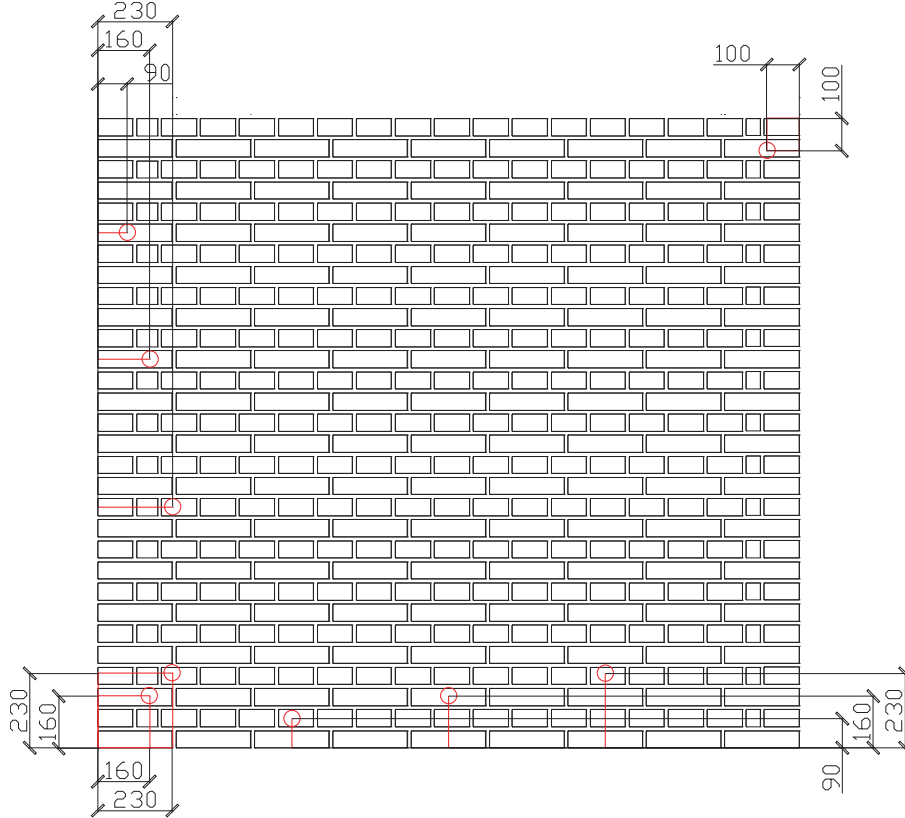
The anchor arrangement. It should be noticed that in spite of what is shown in the figure the anchors are always arranged in the mid point of the brick
